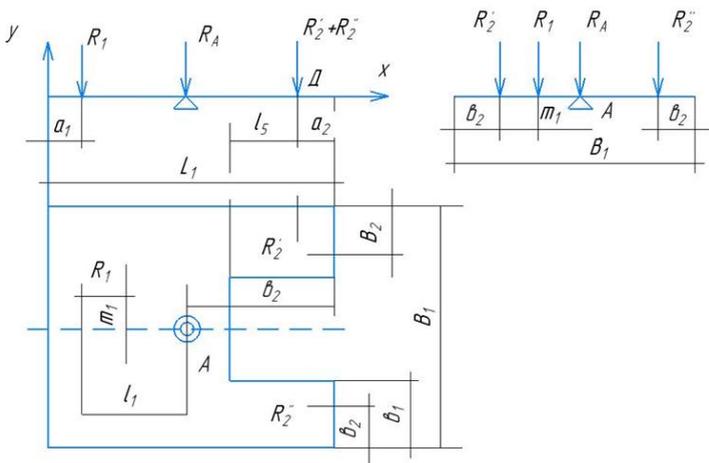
The design scheme of the bottom-hole base part of the overlap part with a double-hinged connection
